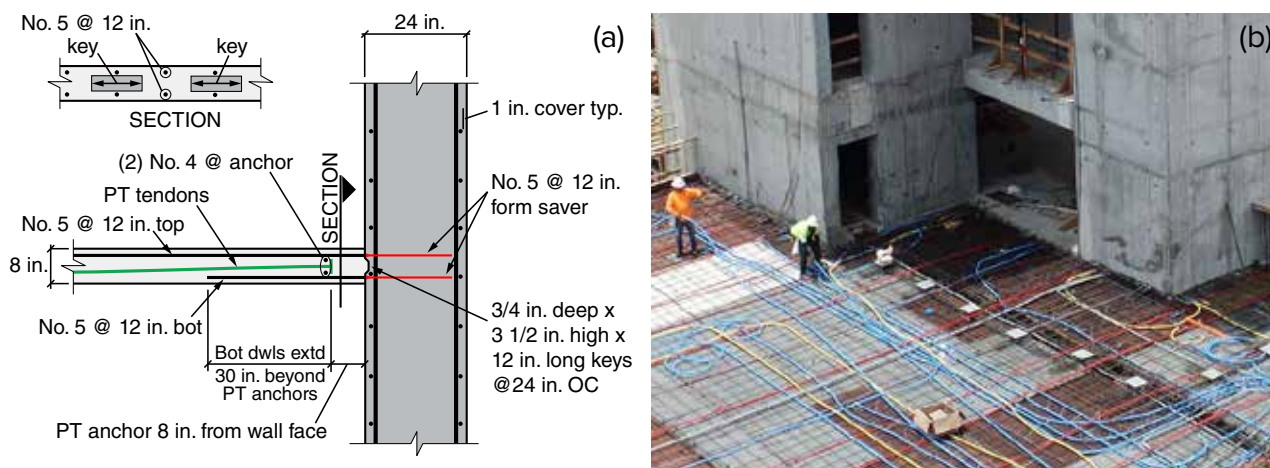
A highly constructable option for strand anchorage is to place dead-end anchors near the wall face: (a) a detail from the referenced article; and (b) use of such details allows walls to be constructed ahead of floor structures. (Image courtesy of Ceco Concrete Construction.)
